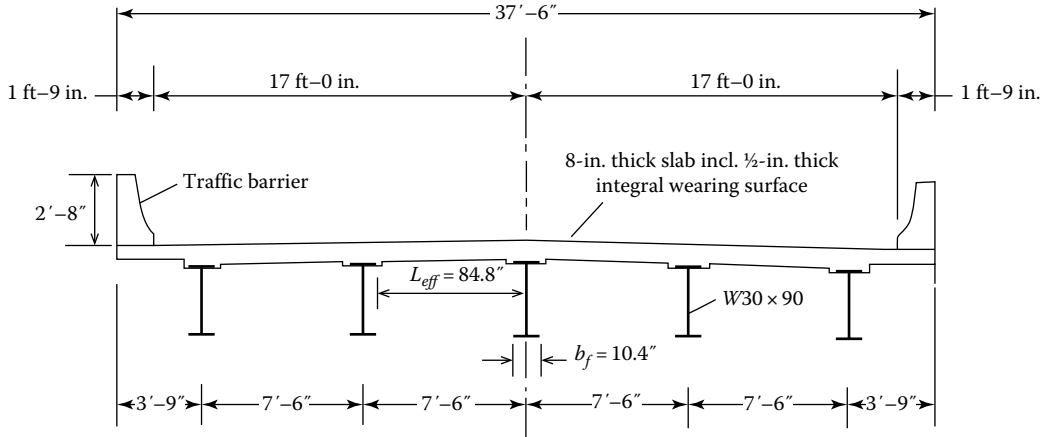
Cross section of composite slab-steel girder bridge cross section for Example 6.10.
